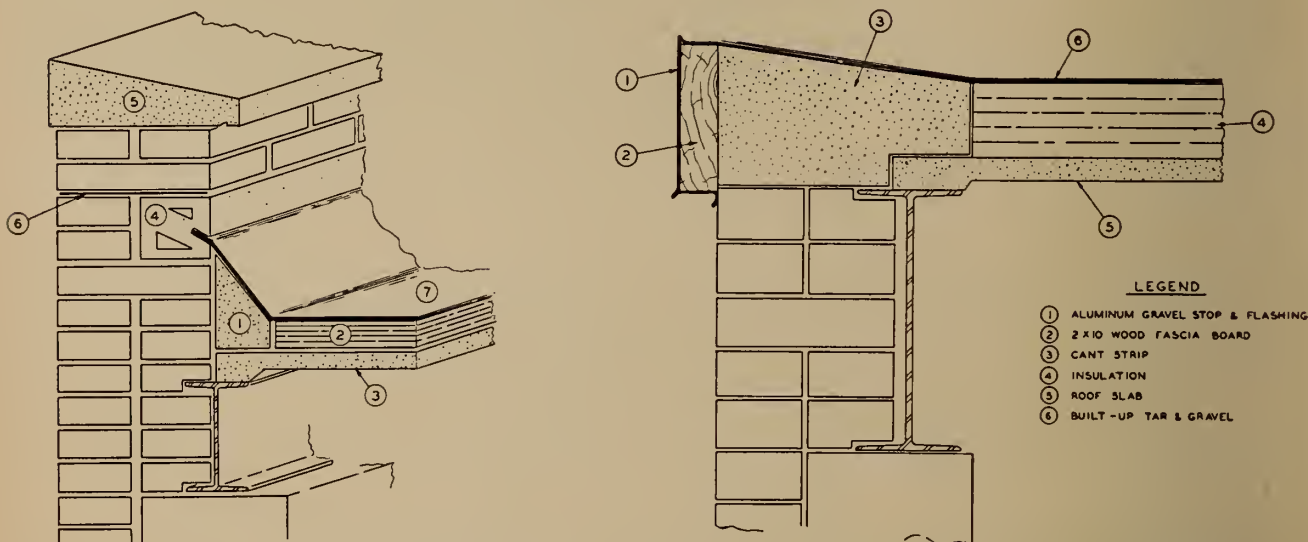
(left). Flashing at parapet wall. Reference legend: (1) cant strip; (2) insulation; (3) roof slab; (4) flashing block; (5) stone coping; (6) through-wall flashing; (7) built-up tar and gravel. Fig. 5 (right). Flat roof detail.
